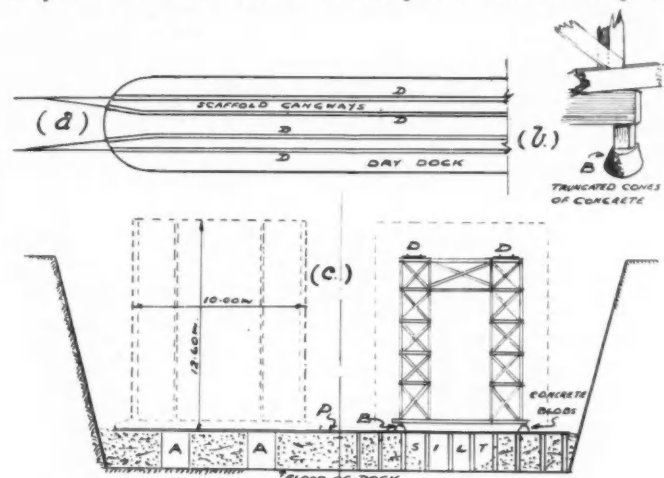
Diagram of Scaffolding etc. in Dry Dock (a) arrangement of walkways and rail tracks D; (b) detail of concrete blob footings; (c) cross-section of dock showing scaffolding trestles, platform P and concrete piers A.
